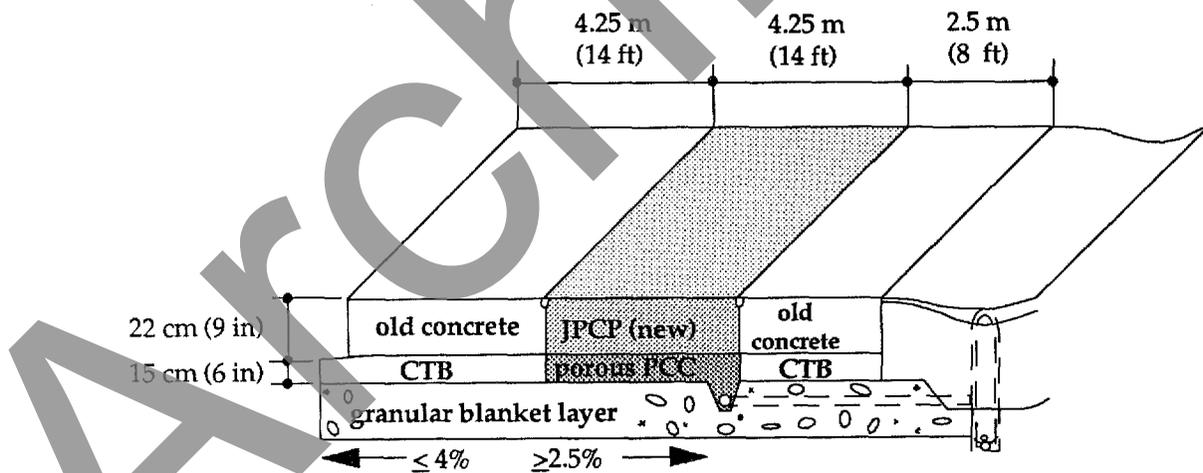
German cross-section for lane reconstruction with porous concrete base.
